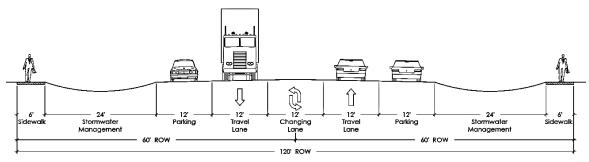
Typical Local Industrial Road, Four-Lane Cross Section
